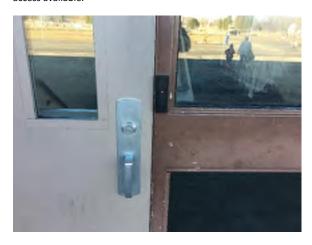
East entrance to 1989 classroom addition. Keycard access available.
